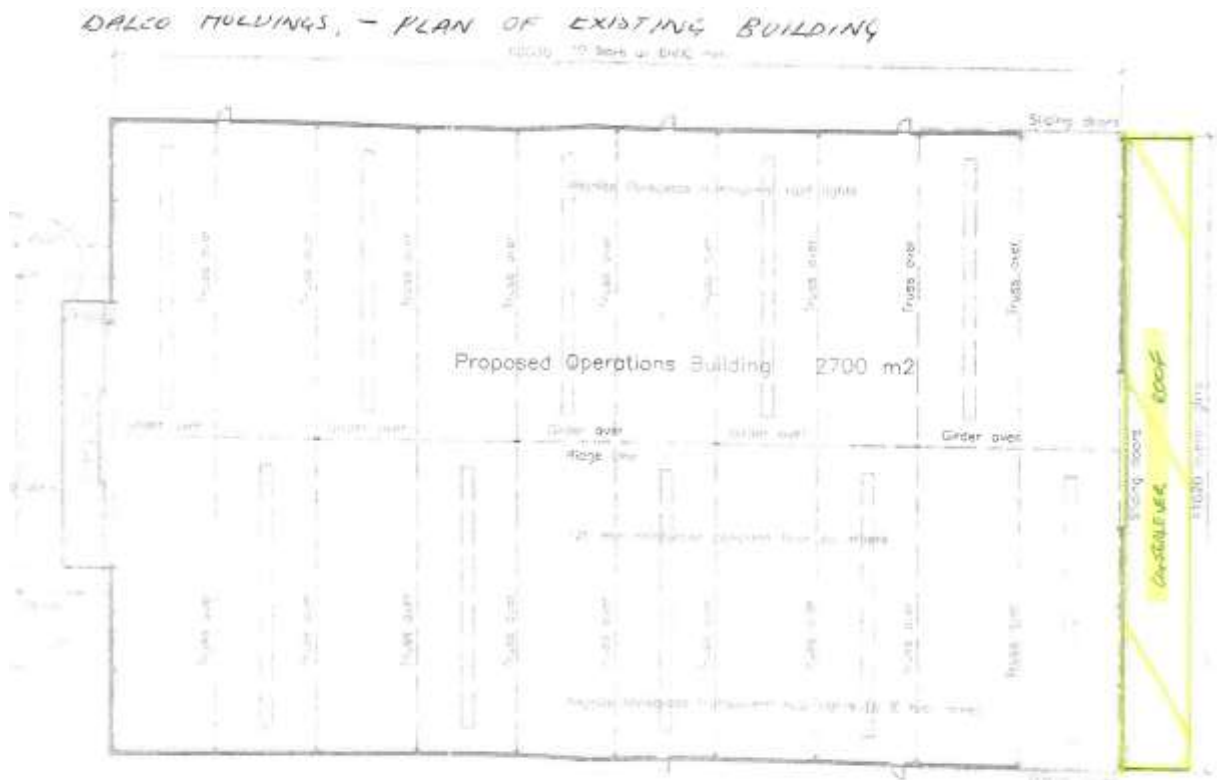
Floor Plan of Existing Operations Building and Proposed Canter Level Roof Structure
